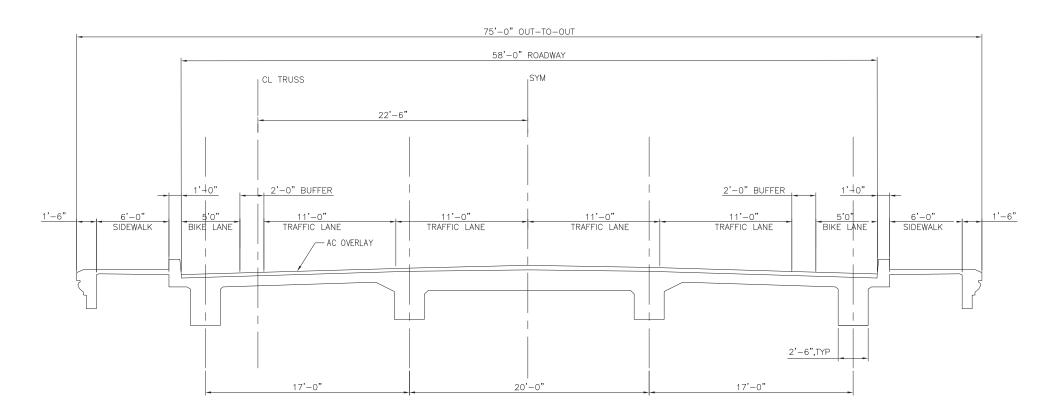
TYPICAL EXISTING DECK SECTION
